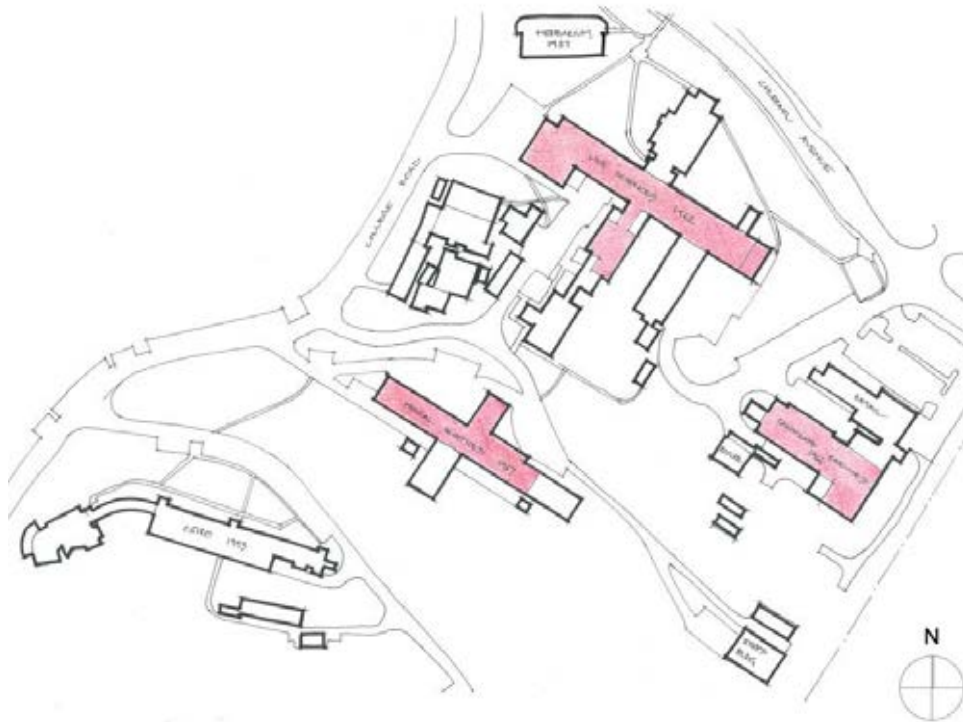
Site Plan Section 4 marking the buildings constructed to 1965 overlaid on current campus layout.
